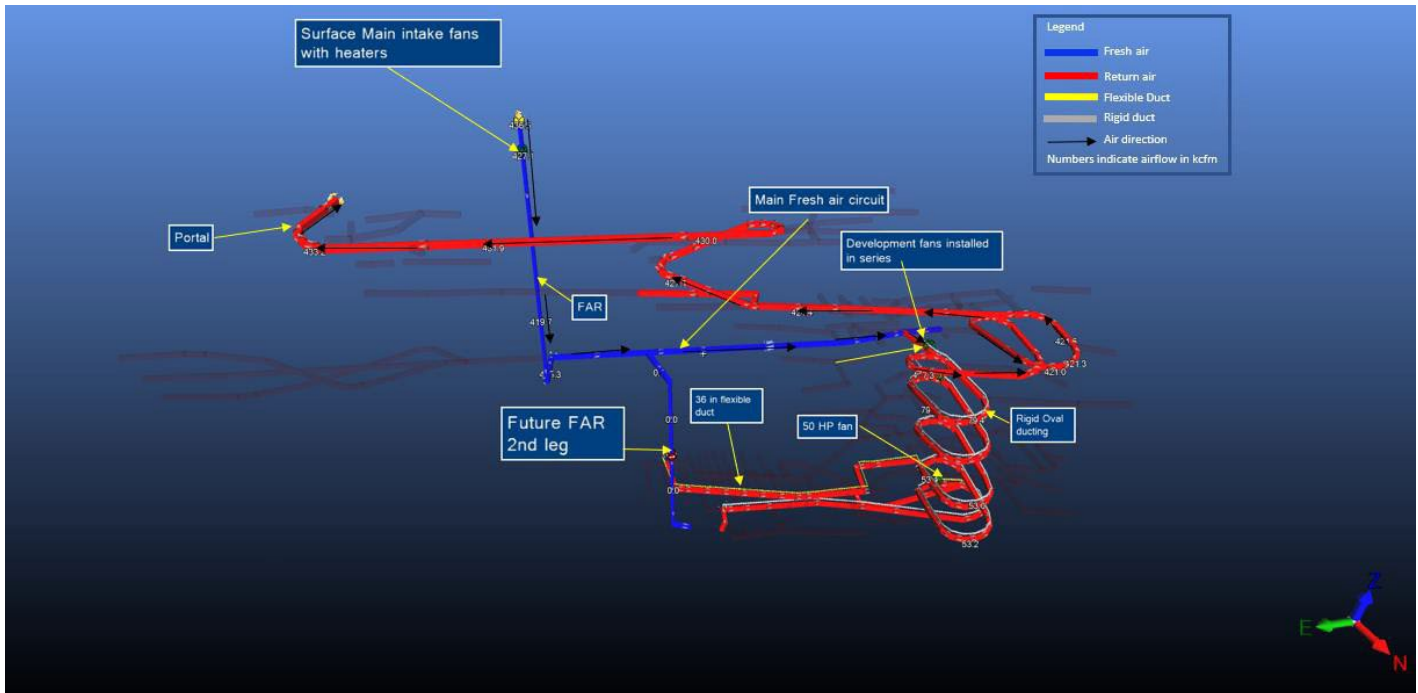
Ramp development ventilation layout following the construction of the first leg of the FAR
